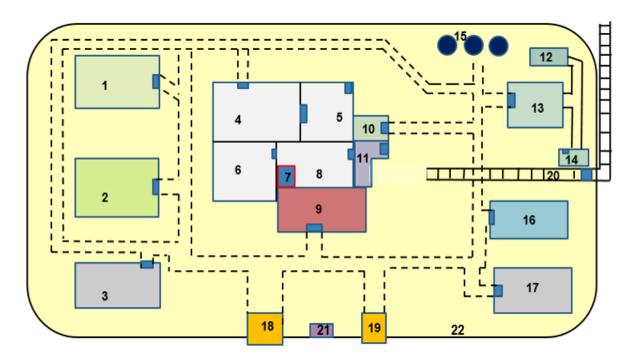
A hypothetical site arrangement and Layout plan for the construction of VVER 1000/1200 nuclear power plant in Ghana
